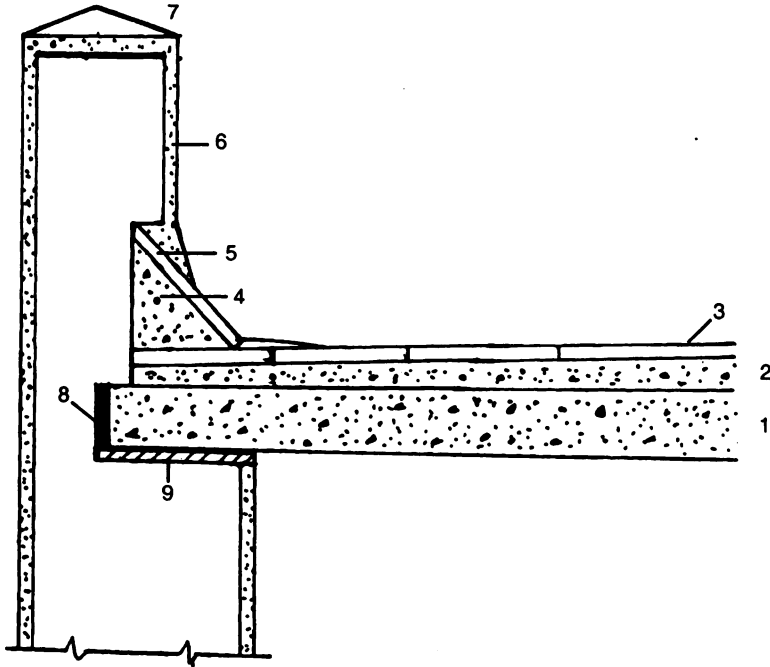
Details of waterproofing junction between parapet and brickjelly concrete terracing: 1. RCC structural slab with bitumen coat on top, 2. Brickjelly concrete, 3. Pressed tiles on roof, 4. Fillet of brickjelly concrete, 5. End tiles laid at 45°, 6. External rendering, 7. Coping (preferably with inward slope), 8. Joint filler, 9. Brickwork finished in 1:1 cement mortar whitewashed and laid with kraft paper.
